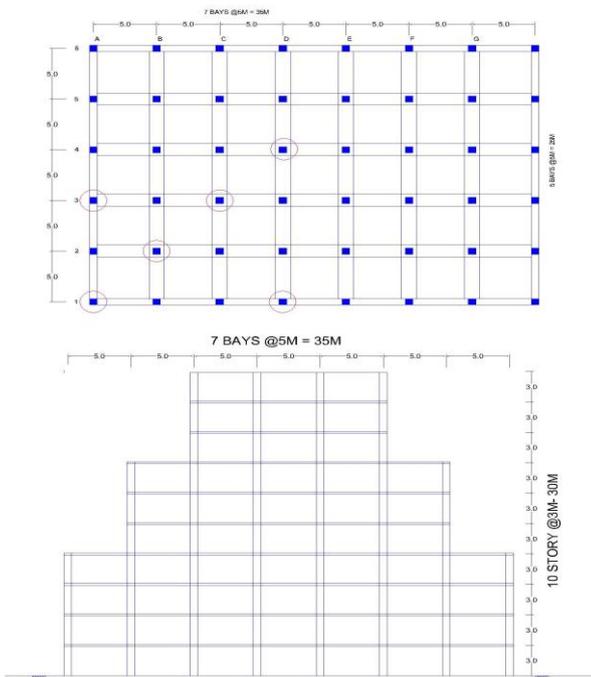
plan and elevation view of studied vertical Geometrical irregularity on both side as case no 4.
